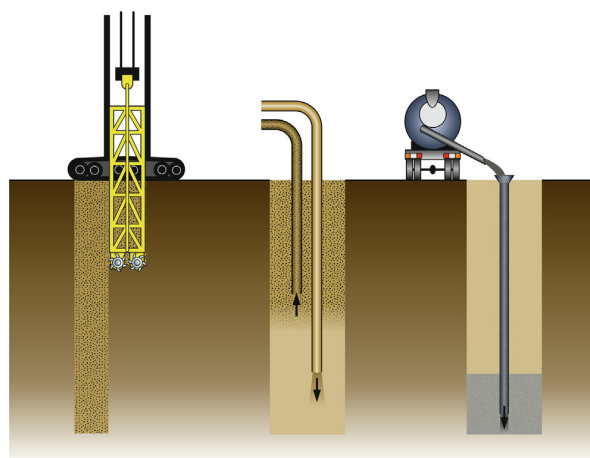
Overview of the construction of a slurry trench wall using a hydromill trench cutter (left) support fluid replacement (centre) and concrete placement using the tremie method (right).
